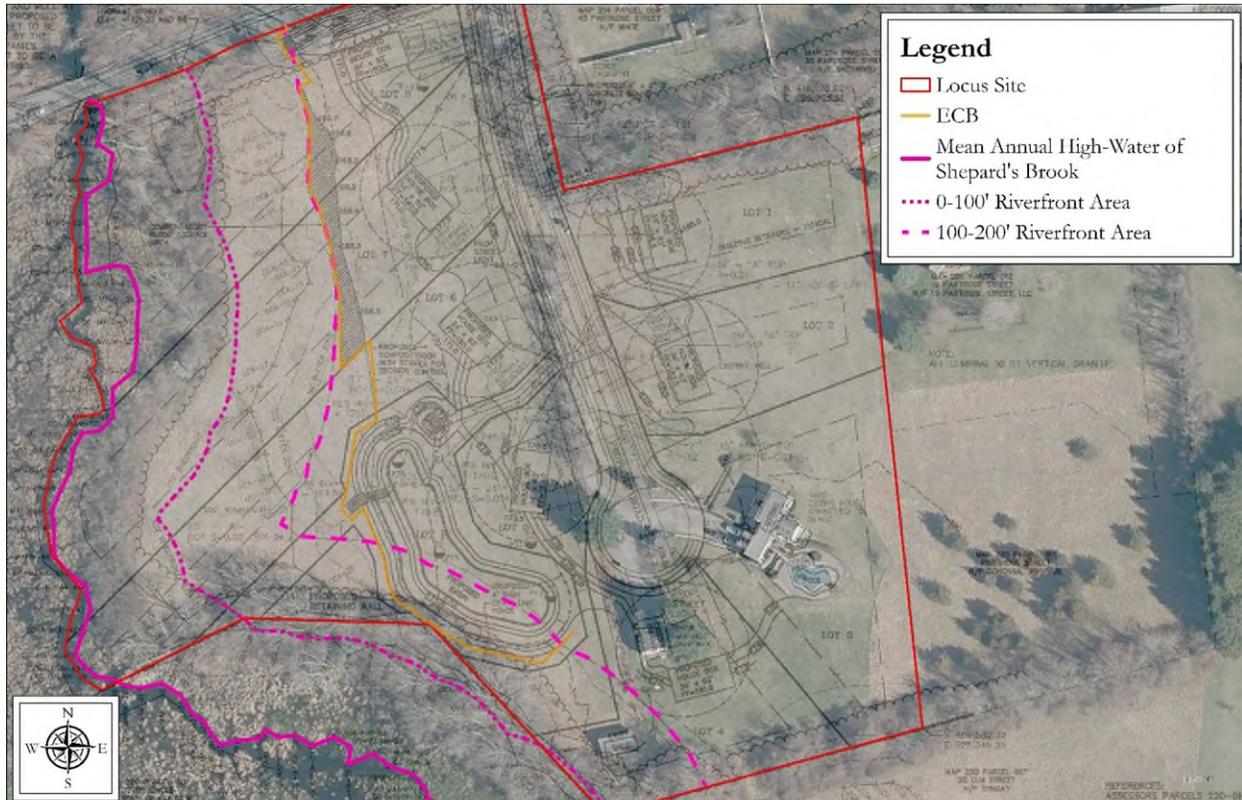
Graphic depicting Riverfront Area and proposed erosion control barrier overlaid on proposed site plan.
